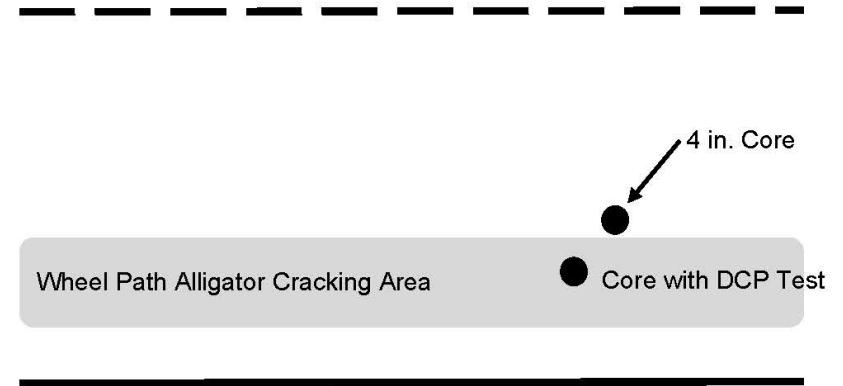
C. Typical Core Location for Alligator Cracking Not Corresponding to a Pavement Structure Joint
